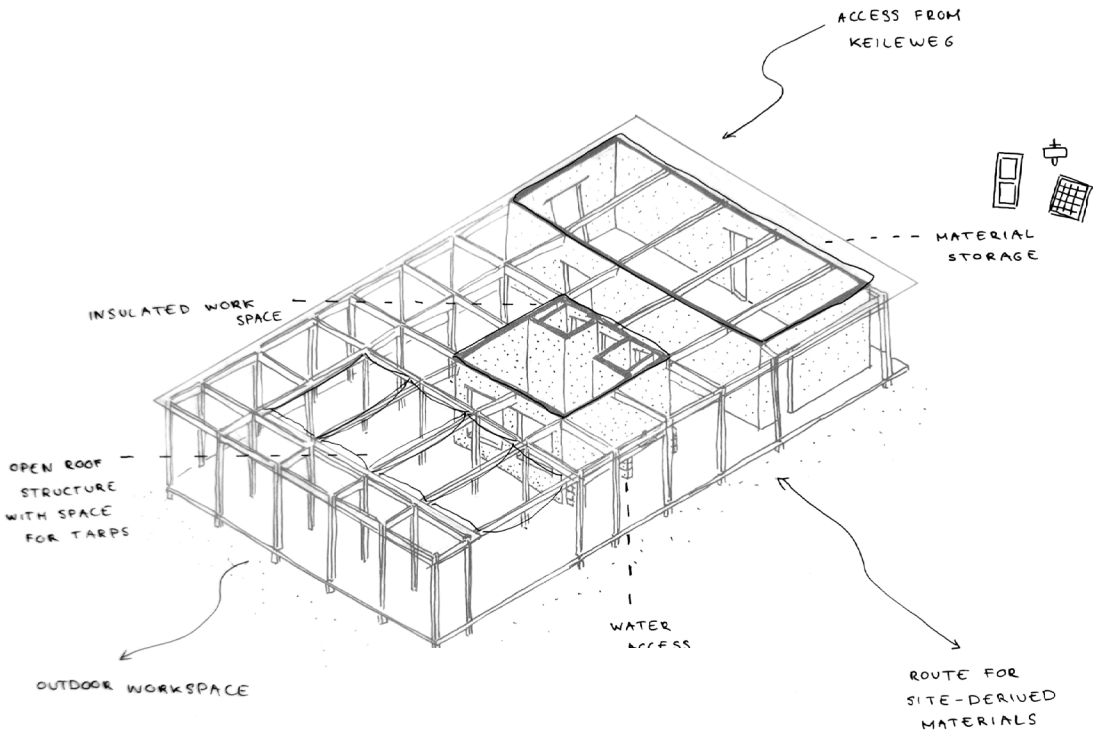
| Material storage and working station. On the former parking lot space will be created to enable the building - unbuilding process
